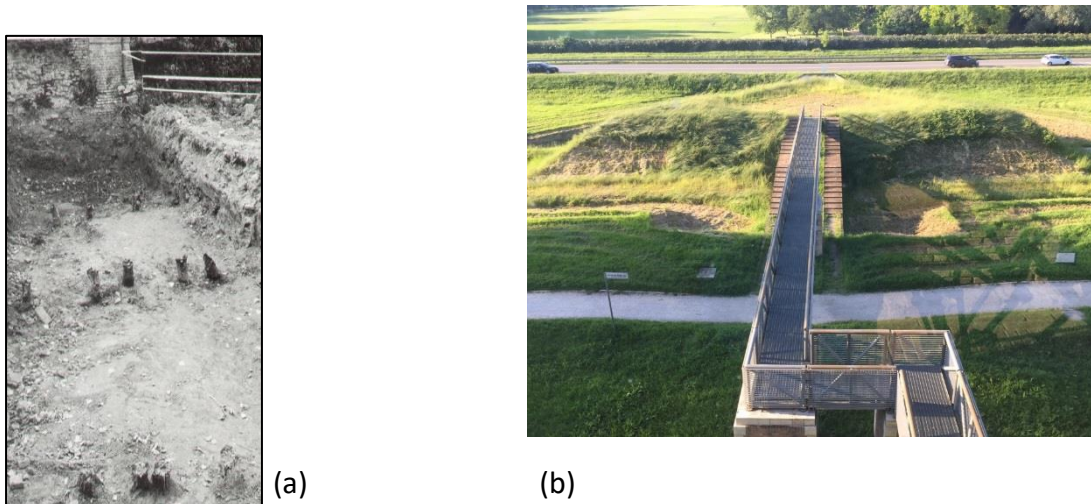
(a) Discovery of original pylons for wooden bridge, (b) new bridge made during restoration connecting Angel’s Gate building with valley
